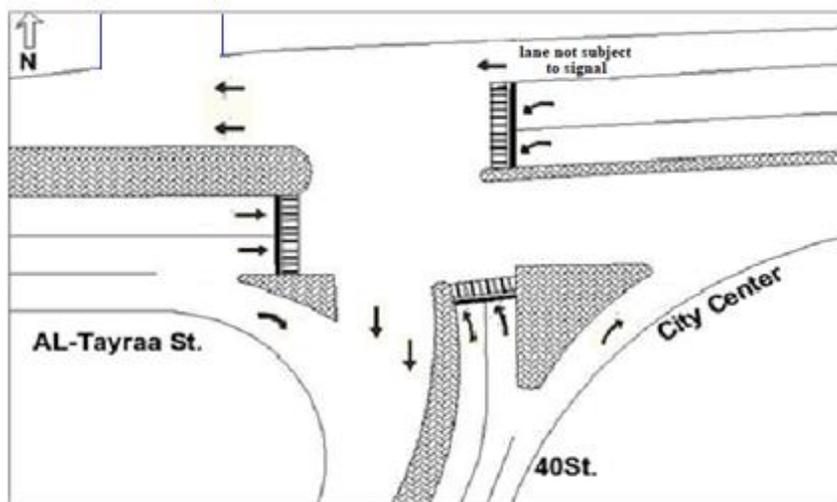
Geometric Layout of Bab-AL-Hussein Intersection
